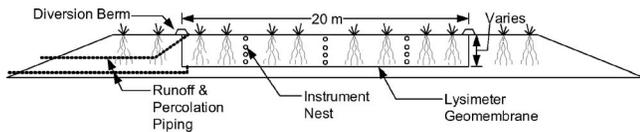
Typical cross section of ACAP test section along the centerline. The lysimeter is 10 m × 20 m. The top deck of the test section is 30 m long and 20 m wide.
